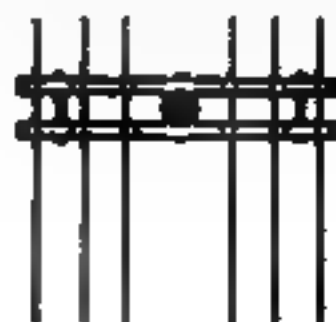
Double arms, using spreader bolts or pipe with a through bolt.
